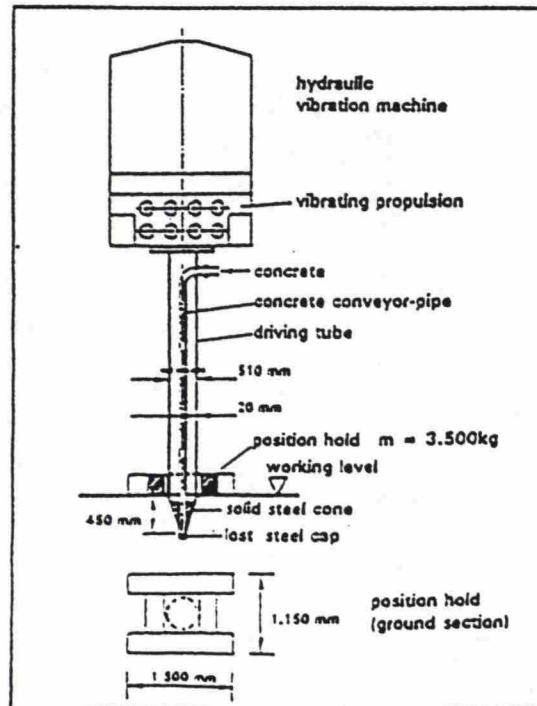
Vibratory Equipment for Fabrication of Concrete Vibration Piles (Preussag System)
